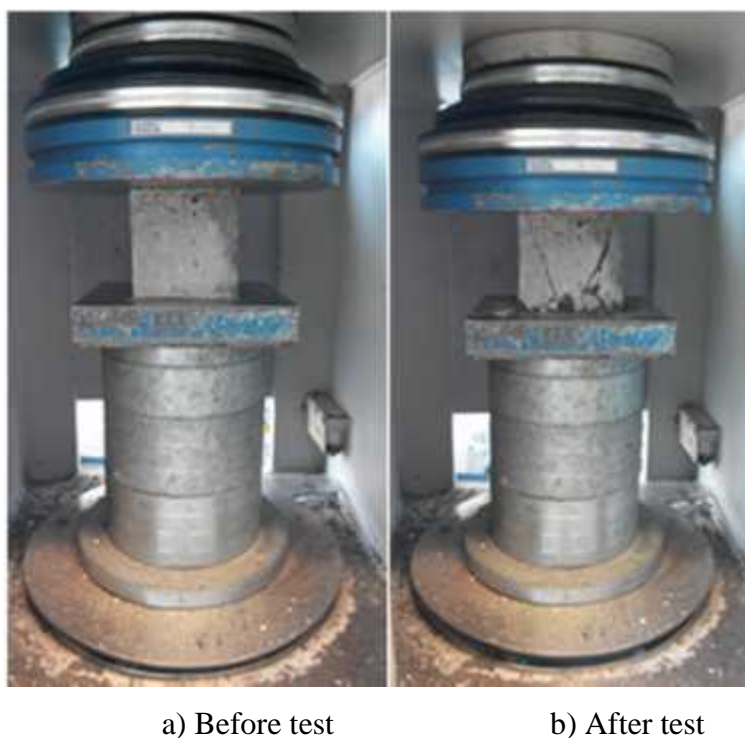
UHPFRC configuration a) before and b) after compression test
